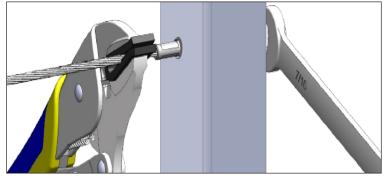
Figure AH. Using a HandiSwage[™] Cable Grip Pad and vice grips, hold the cable in a fixed position while tightening the tension nut.
